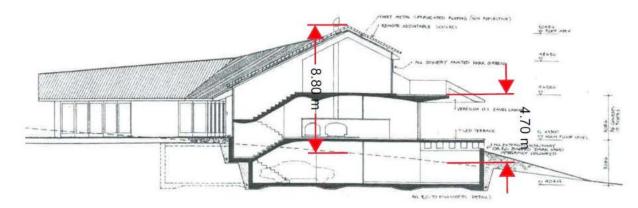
Overall height of previously approved dwelling on site (not constructed)
